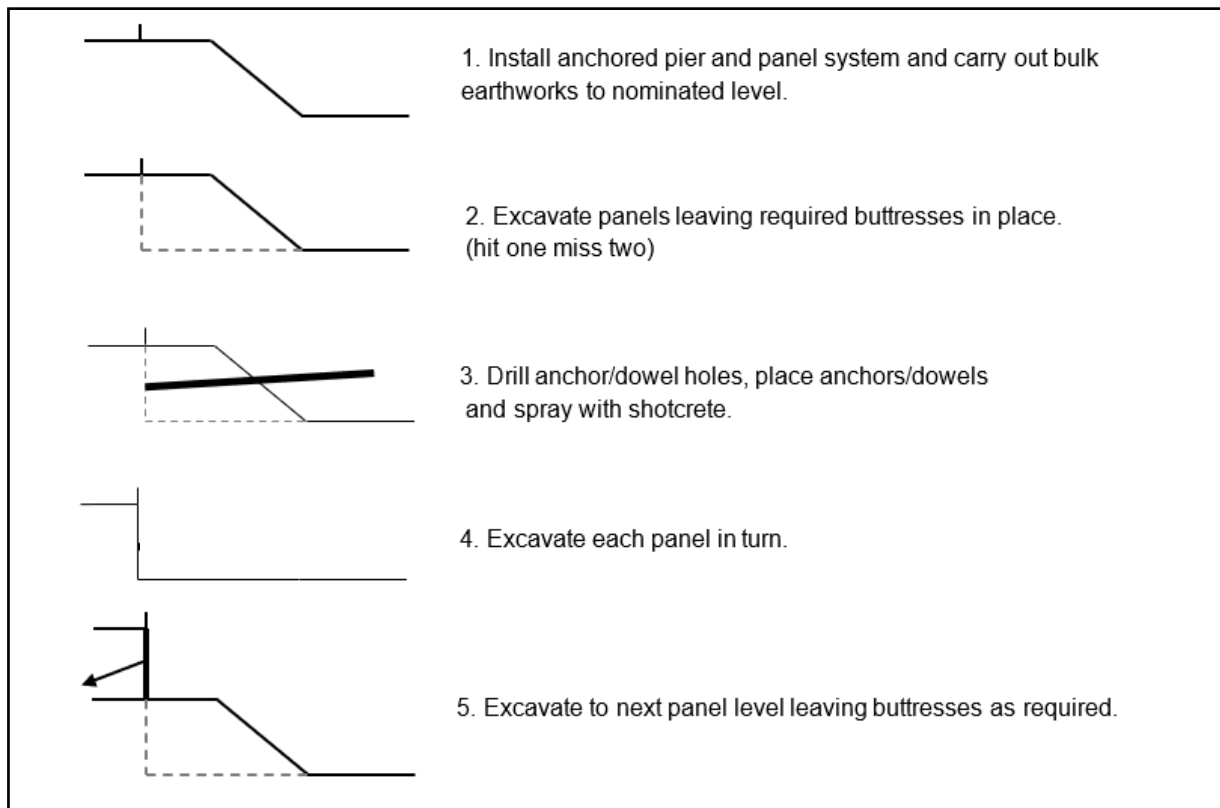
Construction Sequence for Anchor/Dowel, Mesh Shotcrete Wall
